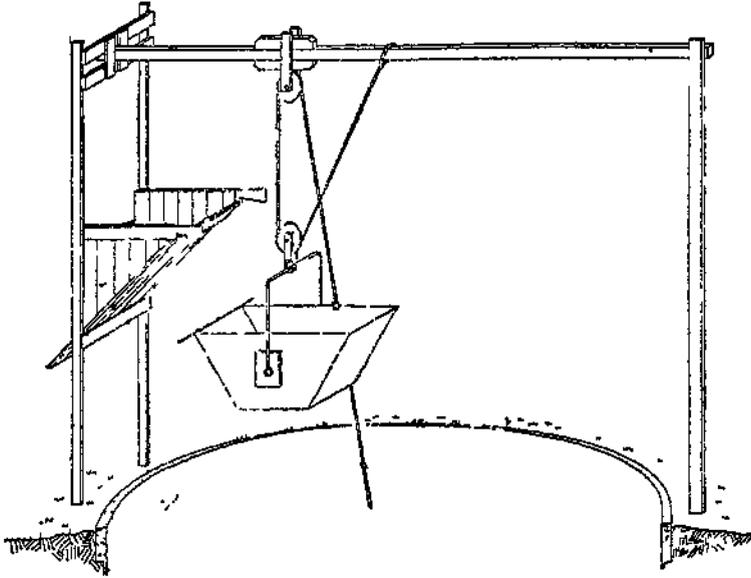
A simple home-made hand hoist for pit and semi-pit silos.
